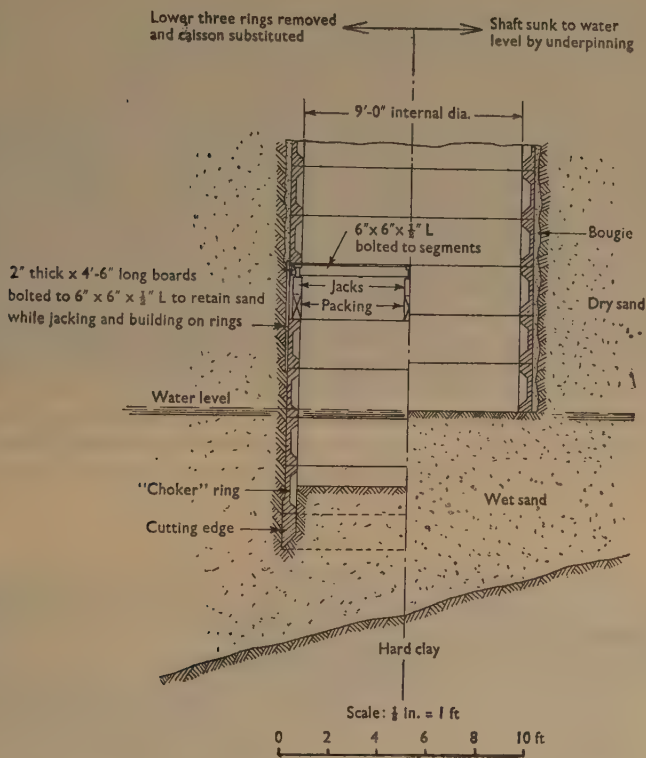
HALF-SECTION THROUGH MANHOLE 4 SHAFT SHOWING CAISSON SINKING
